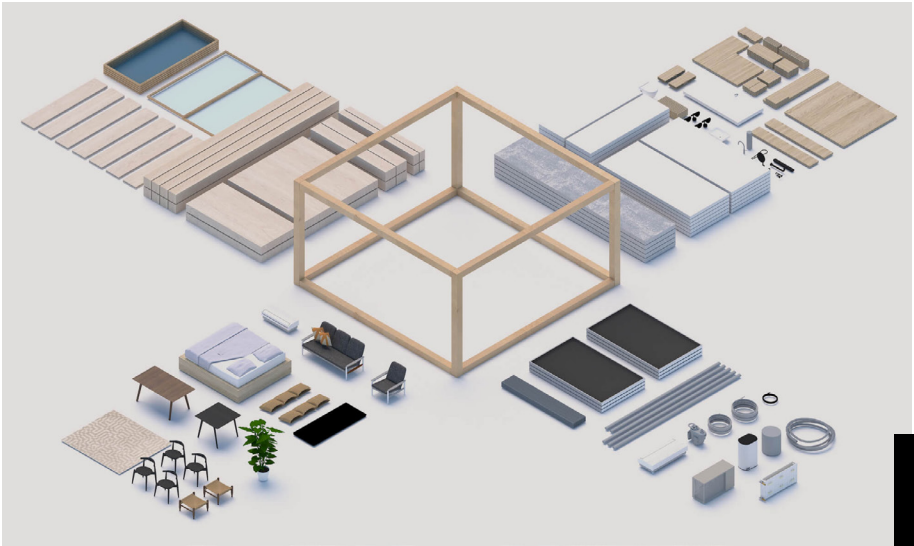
Demountable module parts [SPACE10, n.d.]
